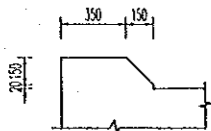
DETAIL OF BRIDGE SEAT DETAIL OF ANCHOR HOLE
